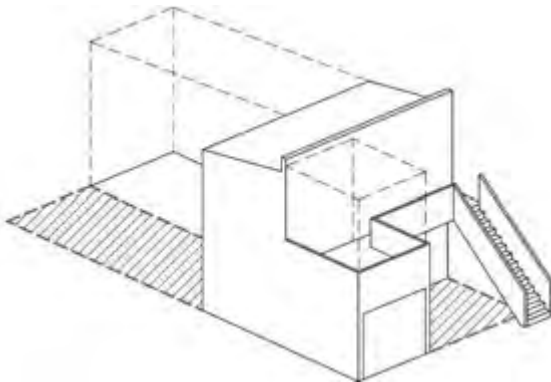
The “zone of expansion” encourages a generous amount of outdoor space to stay open.
